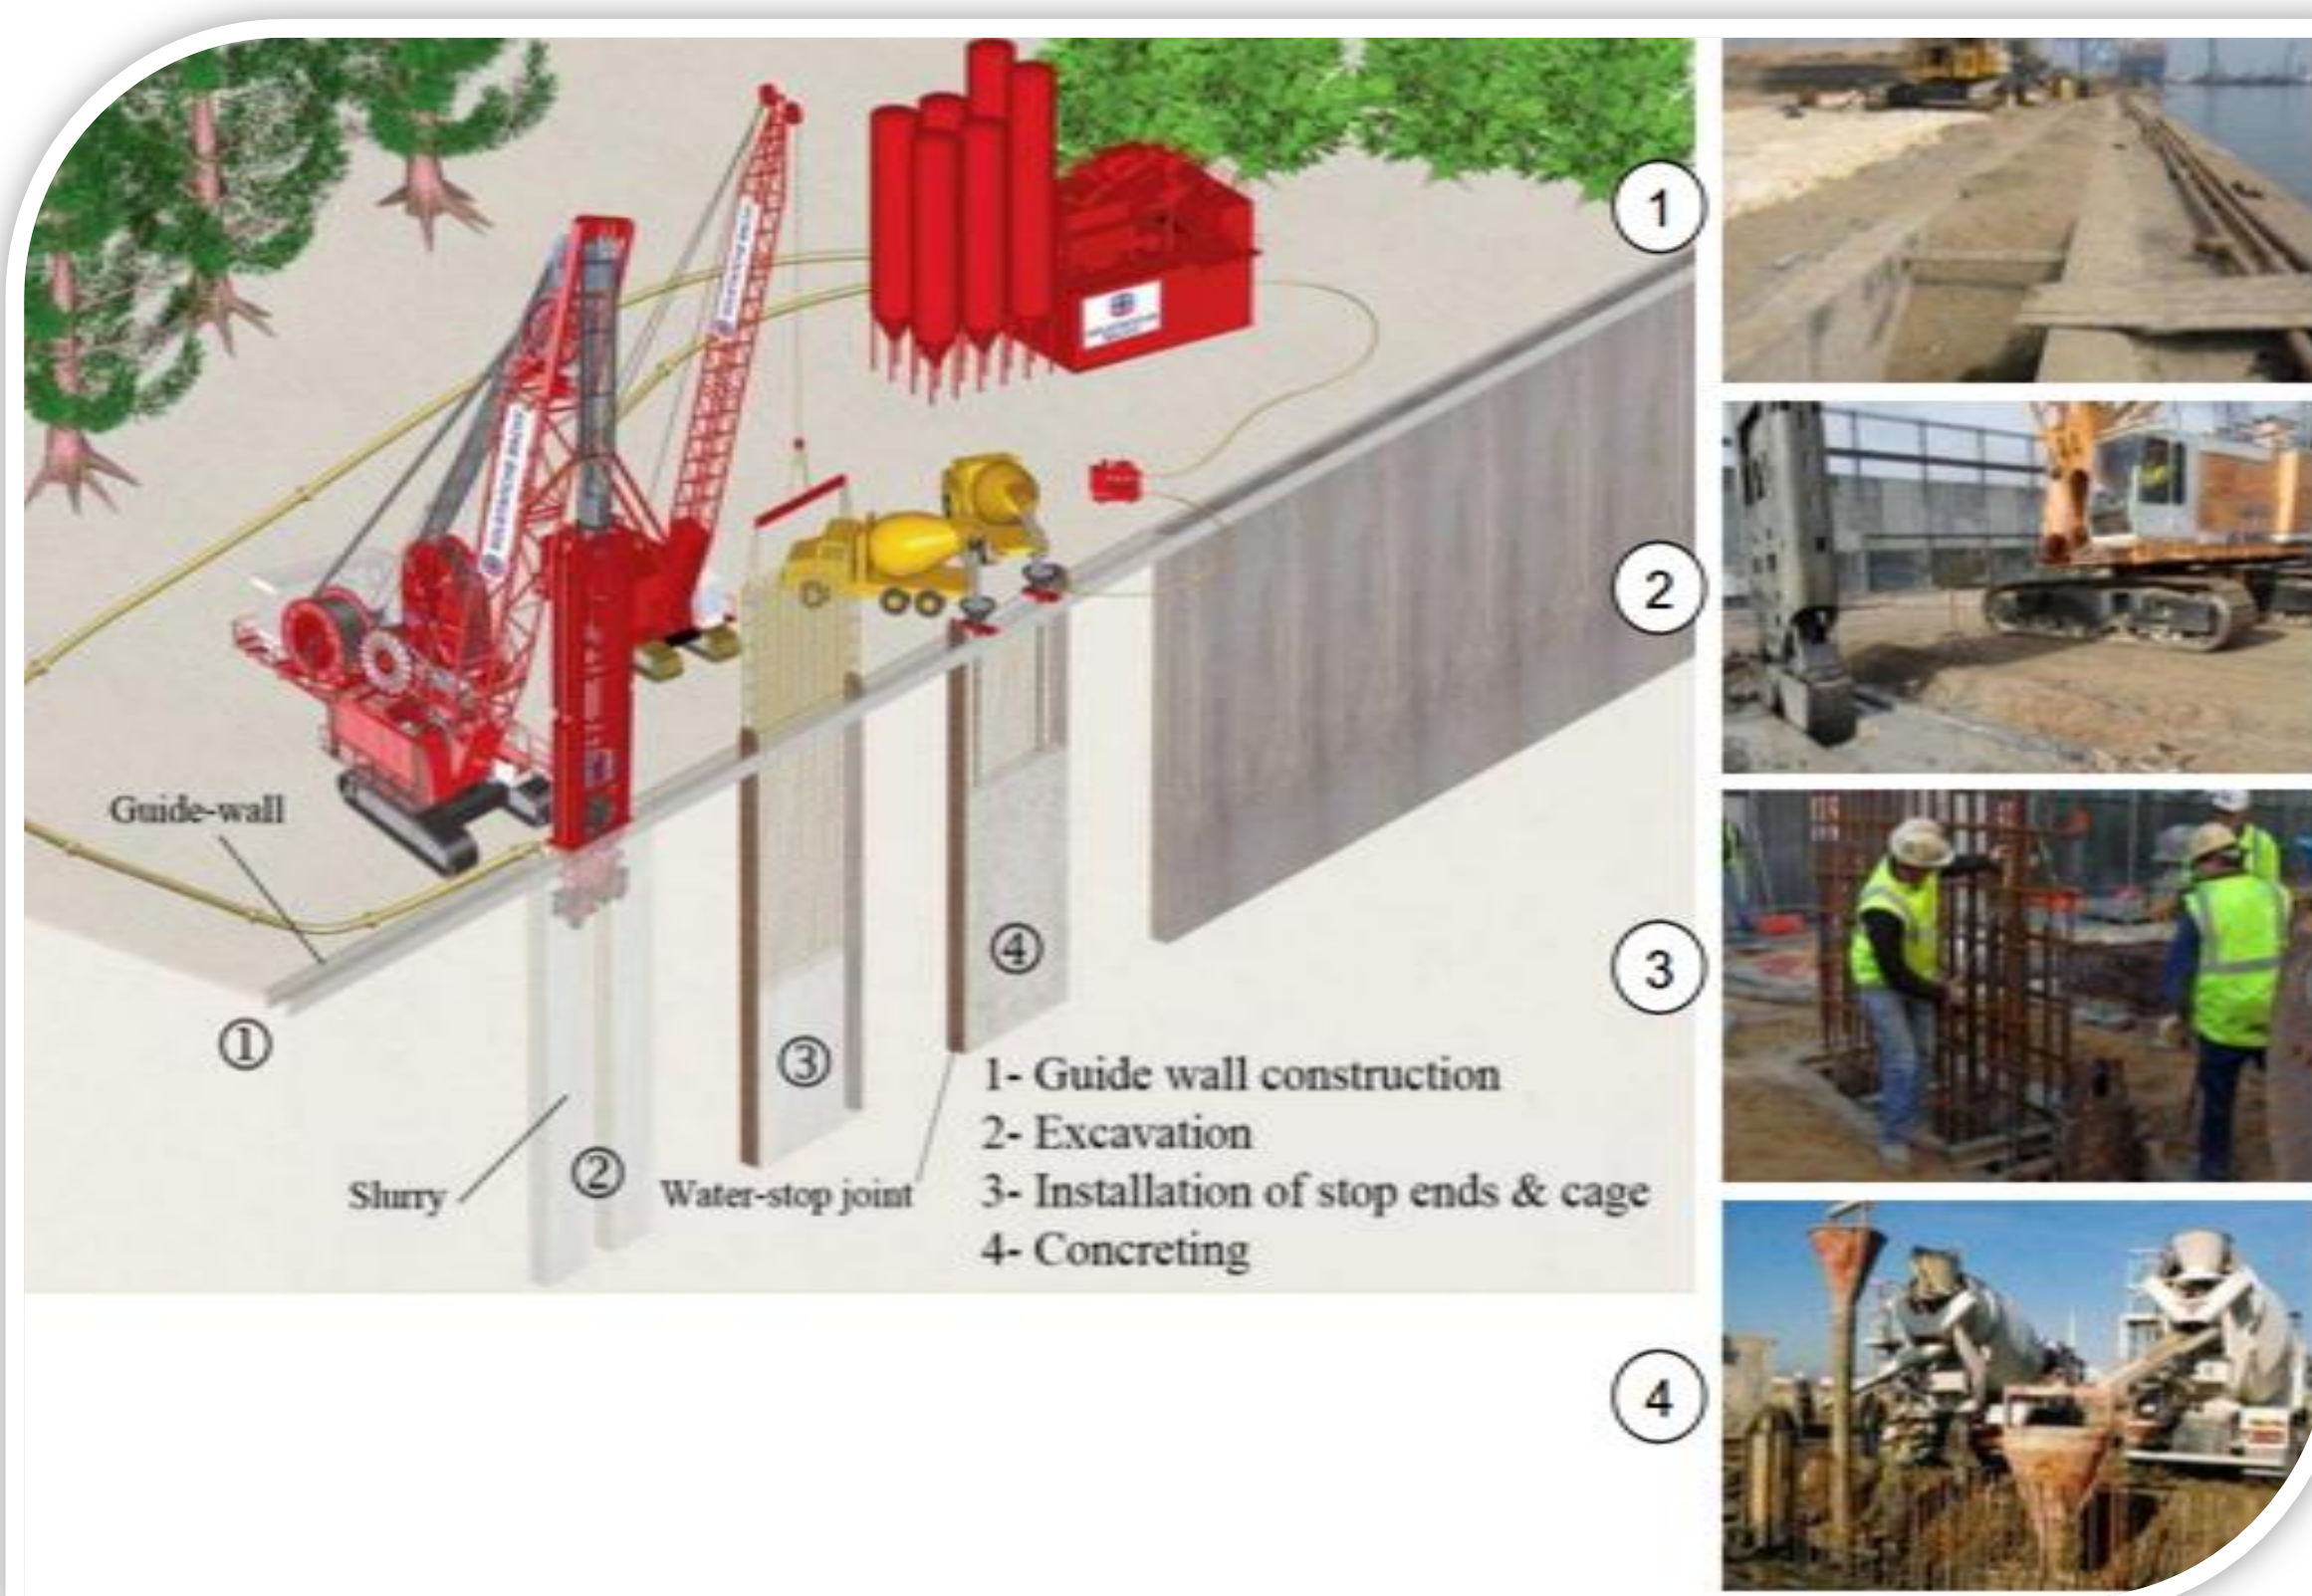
Guide Walls, Trench Excavation, Reinforcement, Concreting
